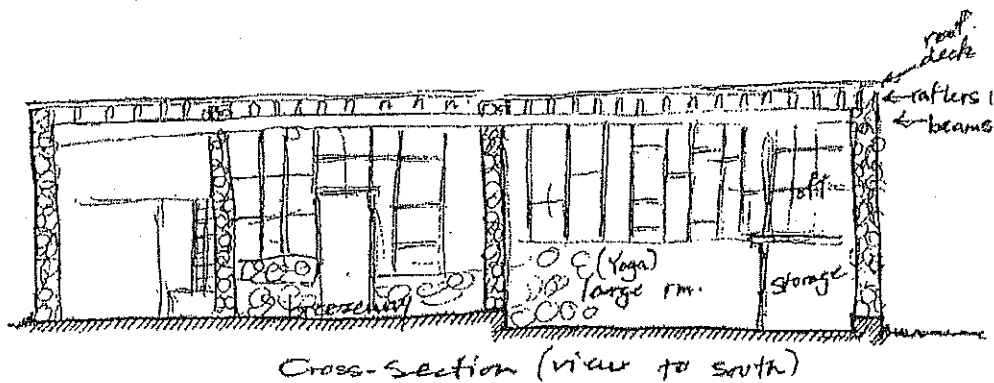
SCHEMATIC SECTIONAL SKETCH (LONGITUDINAL).
